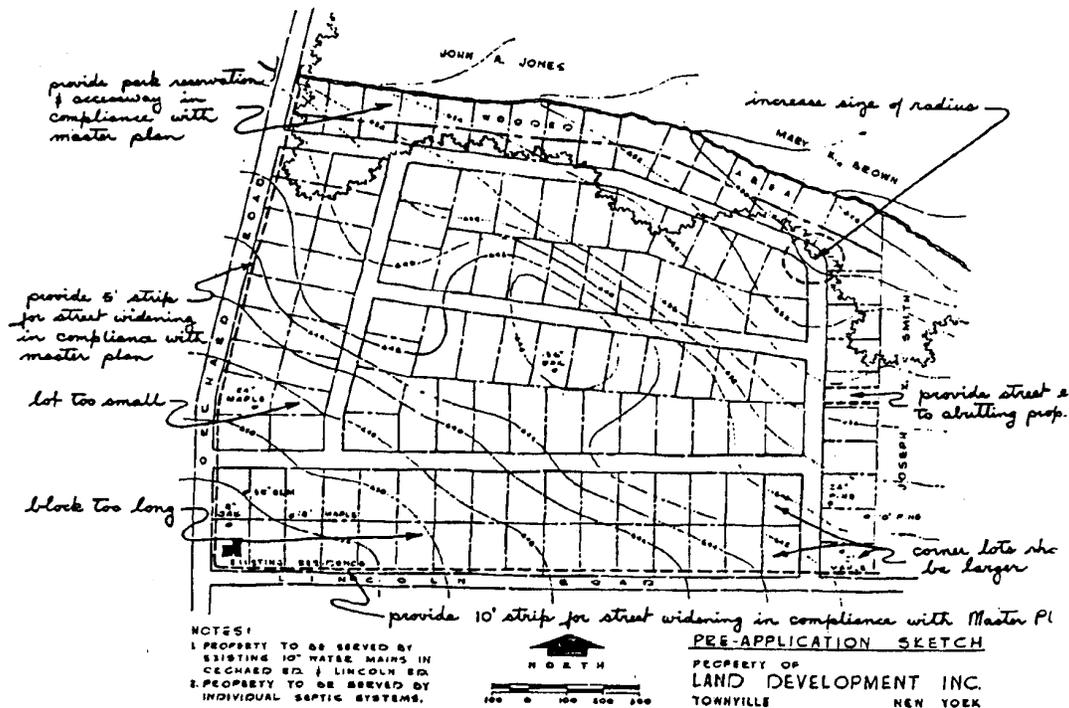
FIGURE A—A pre-application sketch of a subdivision with the planning board's review comments added.
